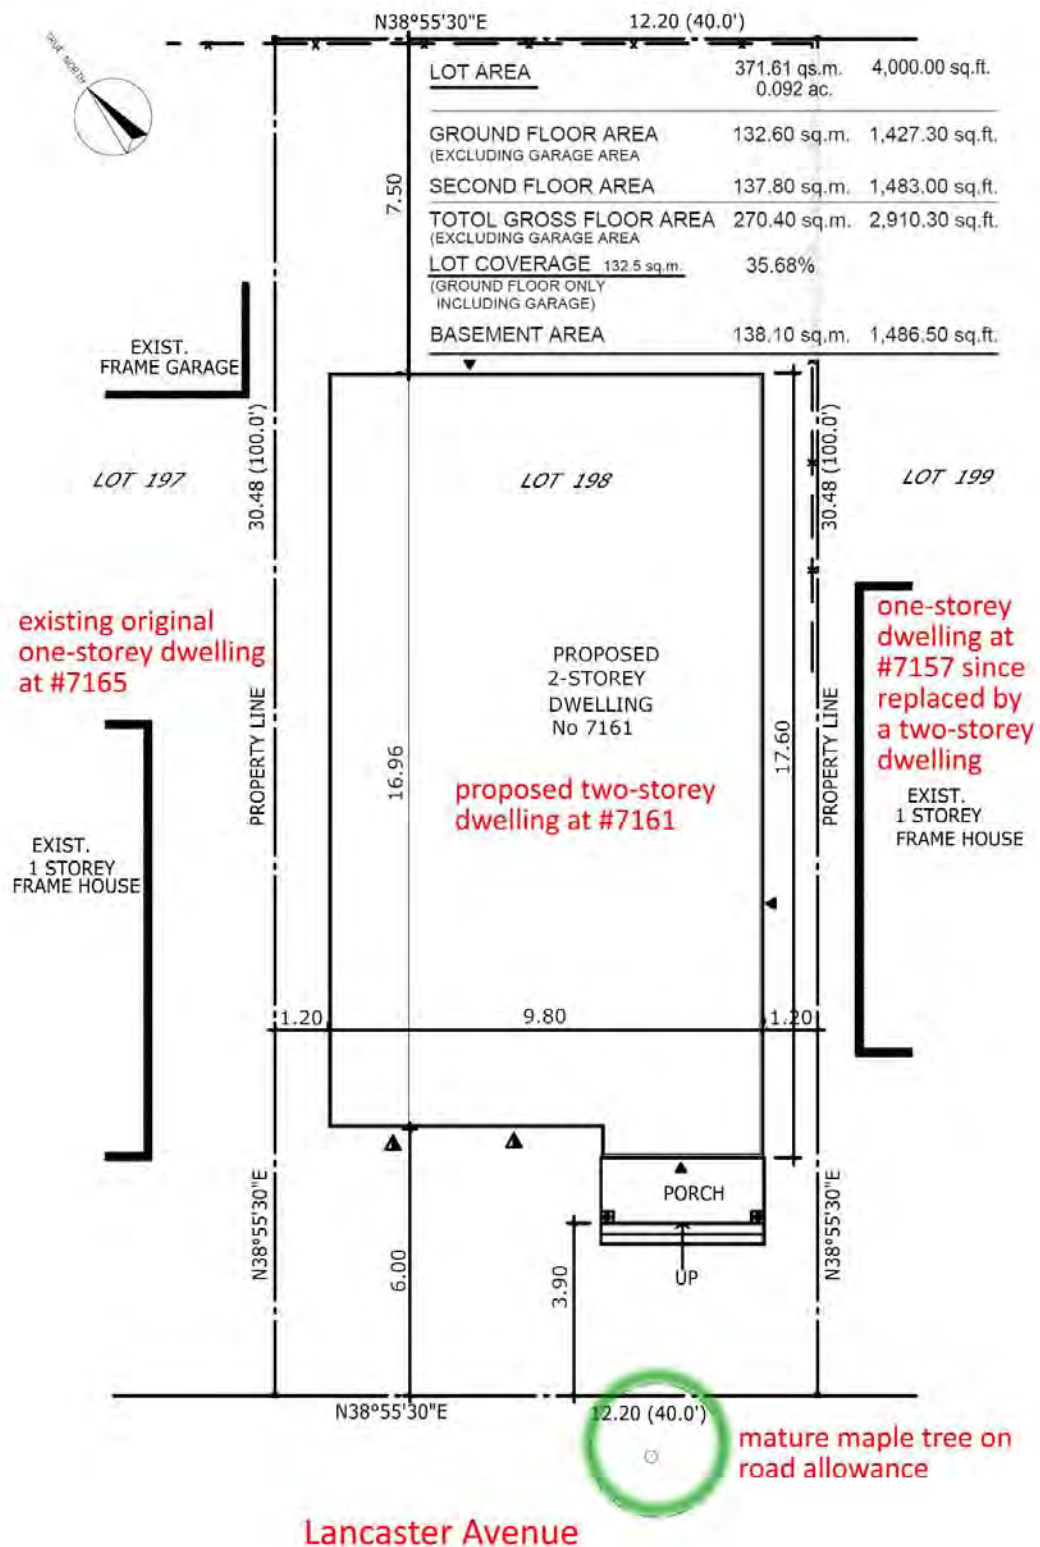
Site Plan prepared by Sanpro Engineering Inc., July 2013.
